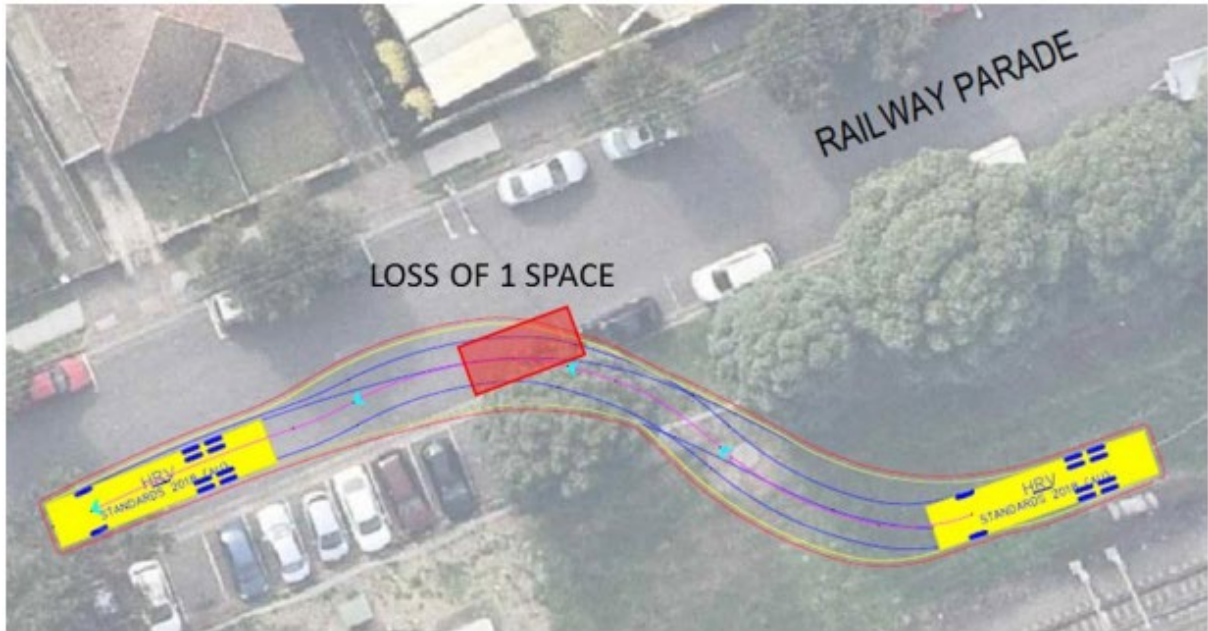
LA5 – M24 14.867U Parking Space Loss
